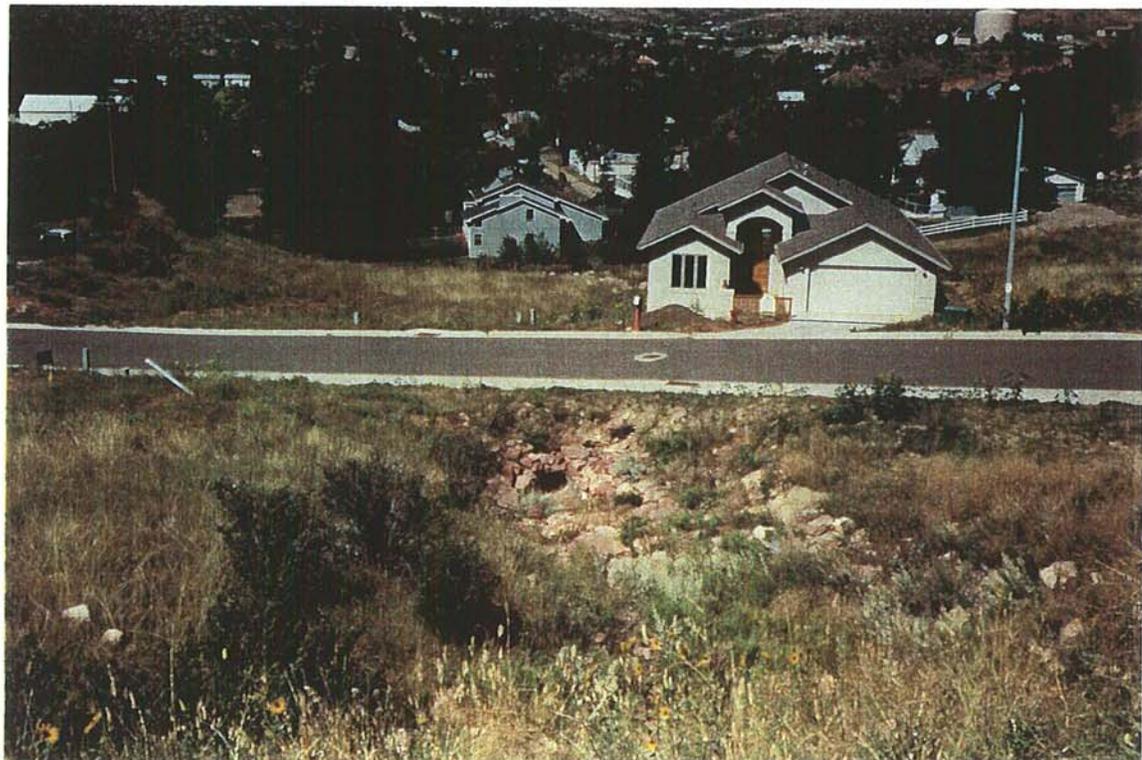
New development must not restrict historic drainage corridors. The roadway may be overtopped in a major storm event. The blue/gray house in the background was constructed on a natural drainageway and could become flooded if drainage ditches and pipes are not maintained. Debris flow is a potential threat in a major storm event.
